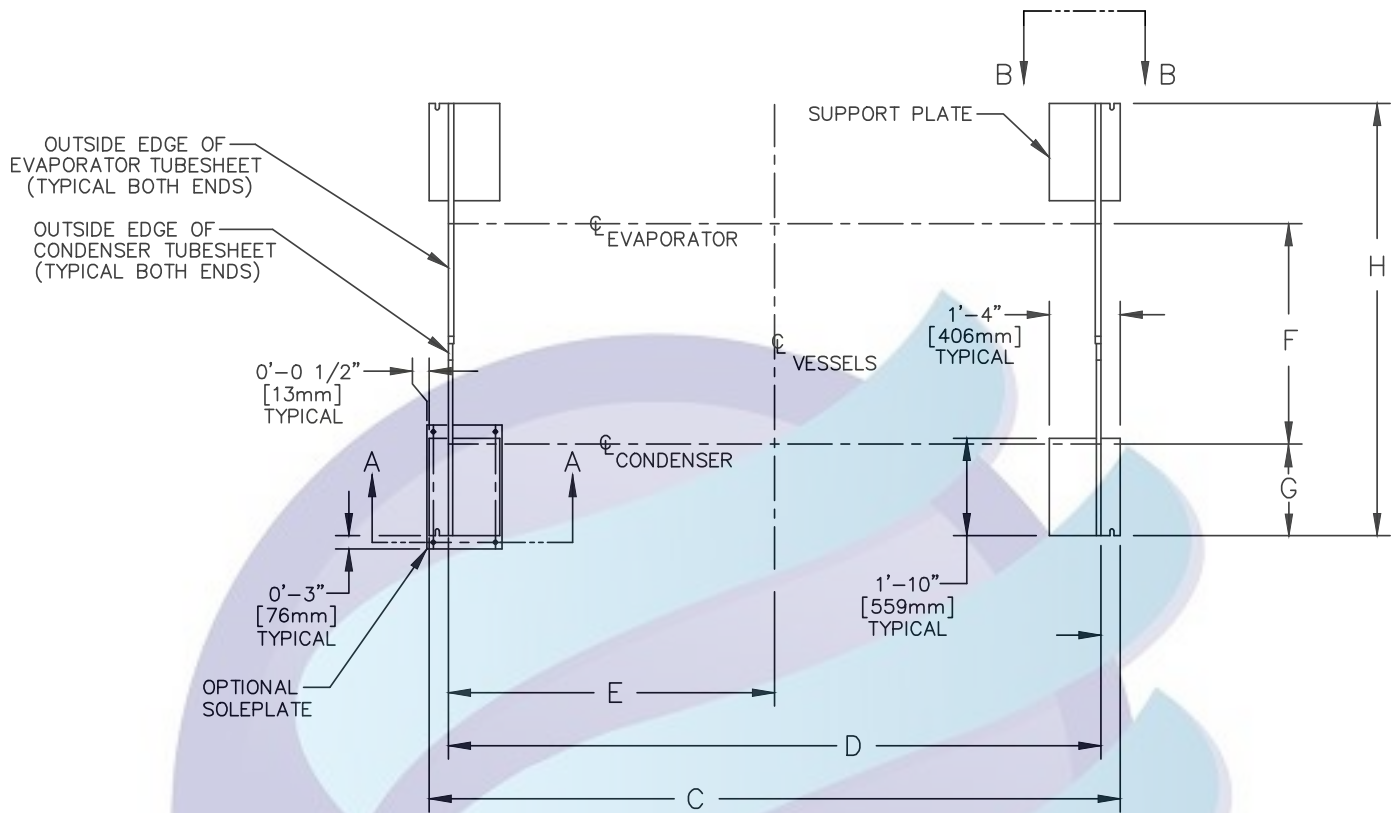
19DV, Bottom View (DV4 Shown)
